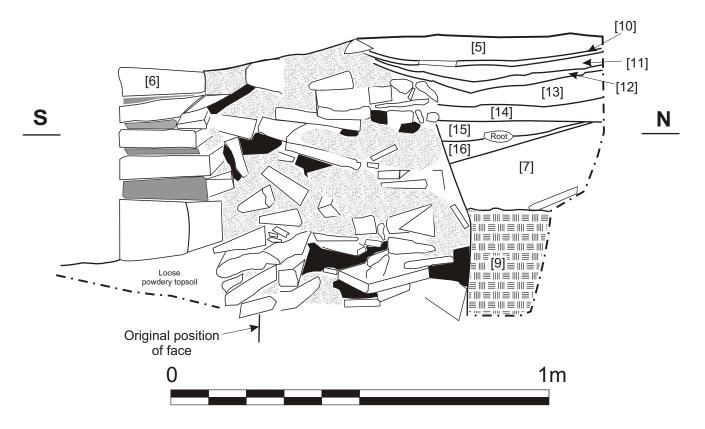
West section of the slot through the terrace wall of the Rhododendron Walk
